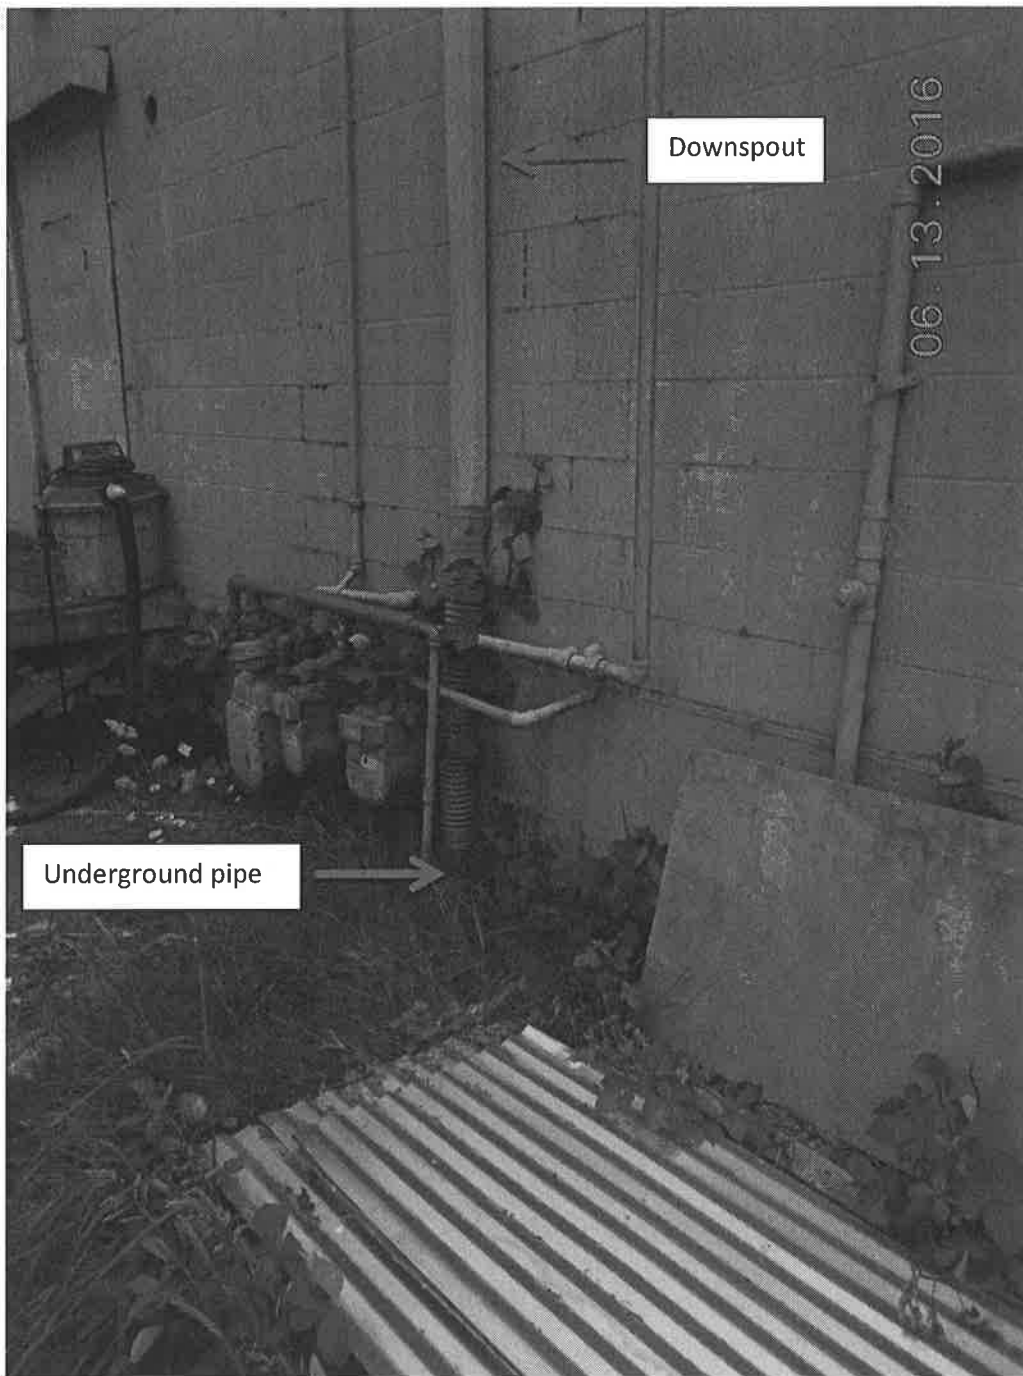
Downspout on west side of building going into underground pipe. All downspouts observed are directed into an underground pipe.
